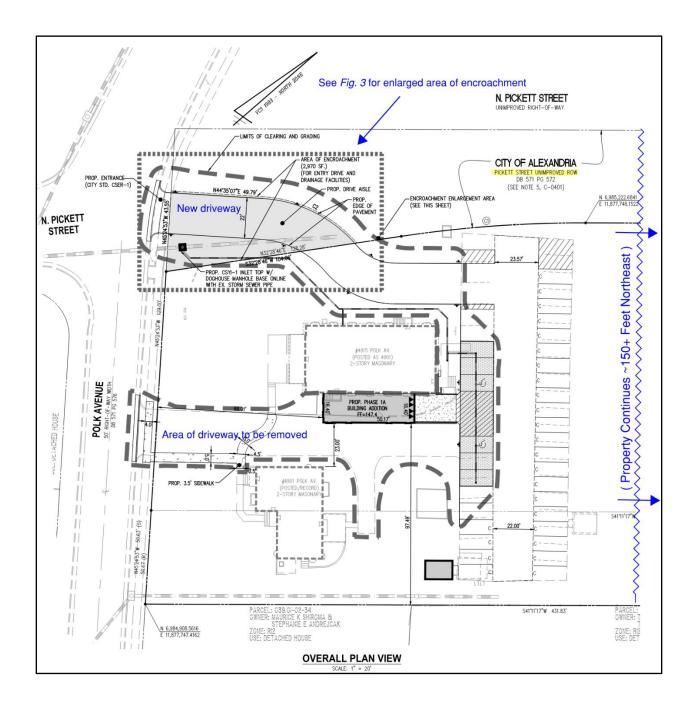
Site Layout Showing Limits of Disturbance and Proposed Area of Encroachment
